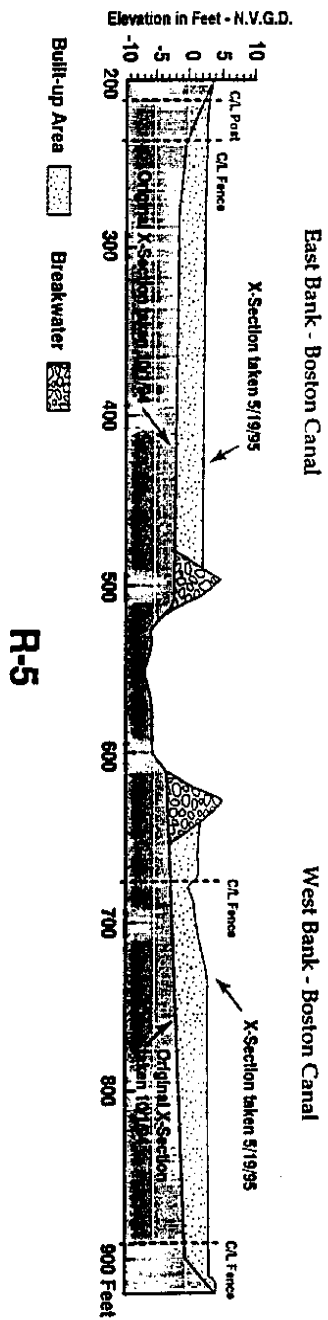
Boston Canal/Vermilion Bay Shoreline Protection (TV-09) elevational profile of east-west transect R-5 showing accretion.
